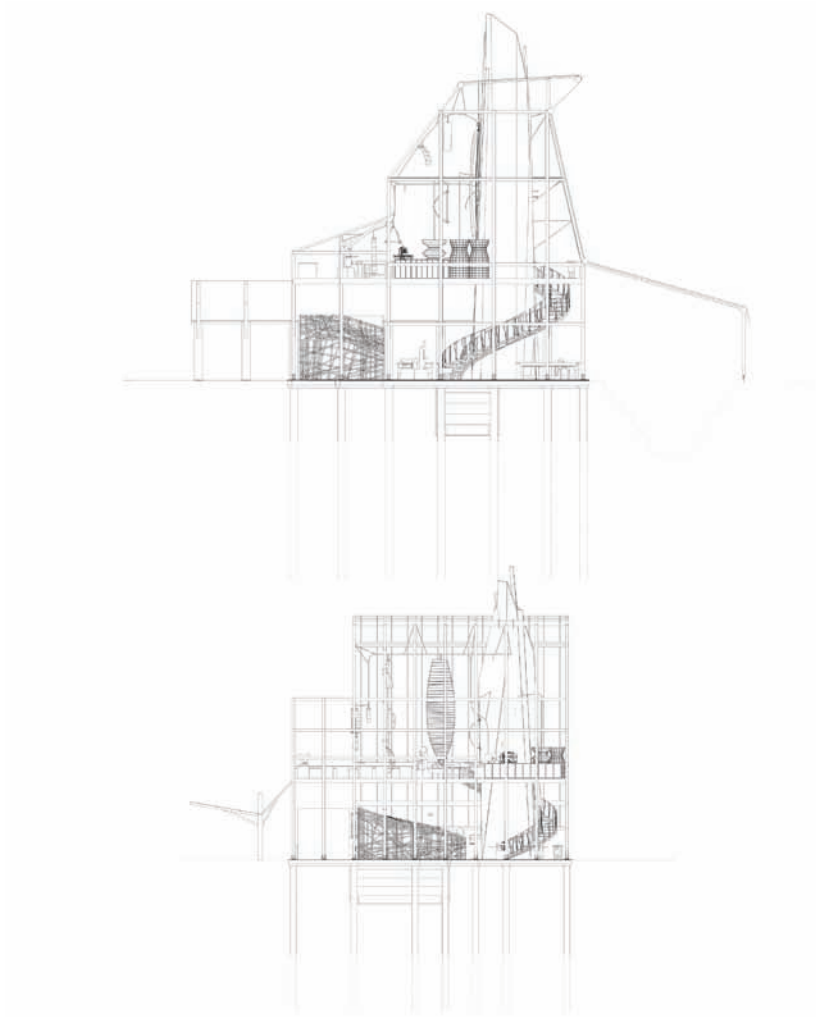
Section through wooden boat construction workshop in Brunel's Pier and the Timber Dockyard, 2016.
